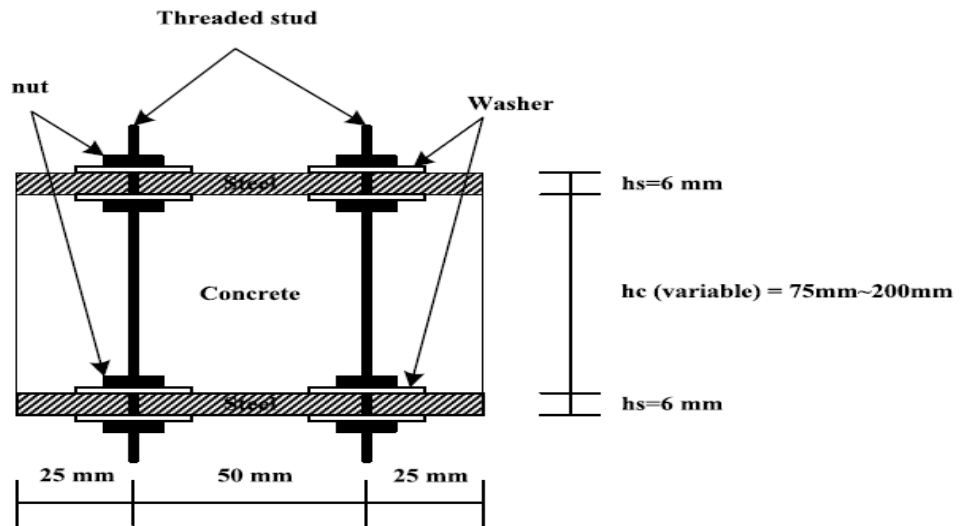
Cross section of SCSS beams, Zebun, 2006.
